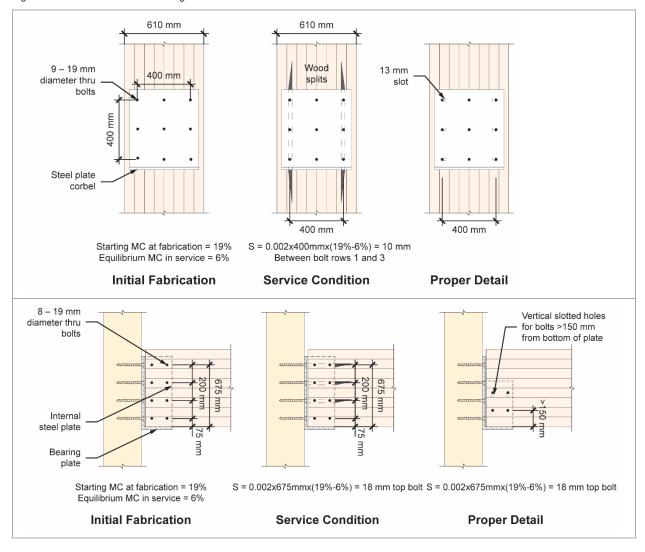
Illustrations of shrinkage considerations in Structural Mass Timber column and beam connections
